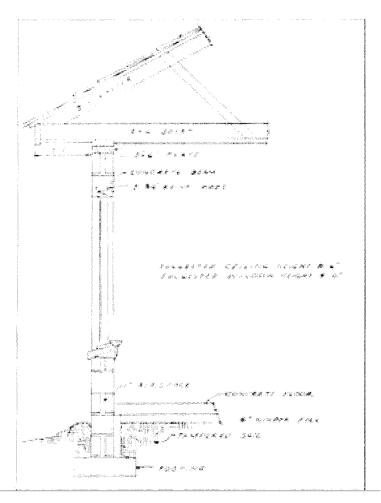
Low Cash-Cost House Wall Section. (Source: Low Cash-Cost Housing)
